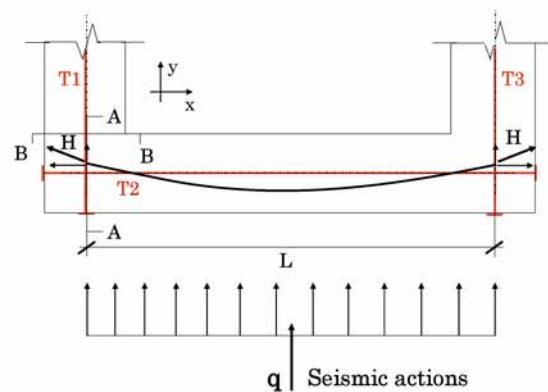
Arch effect within a wall subjected to actions out of its plane.
